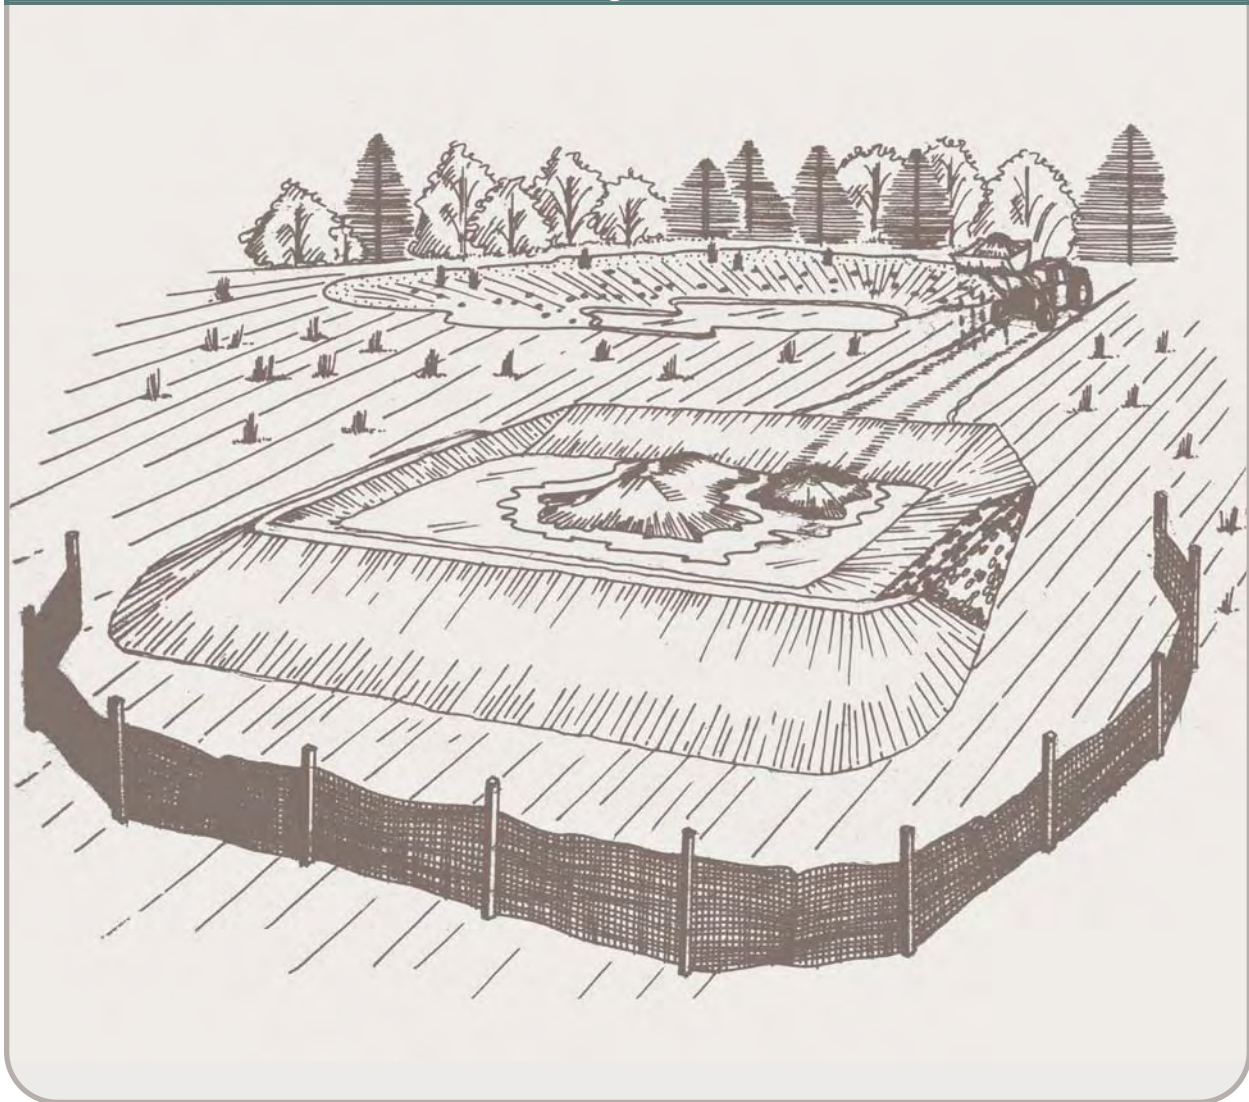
A Cross Section – Example of Non-Engineered Dewatering Containment Area for Dewatering Earth Materials
